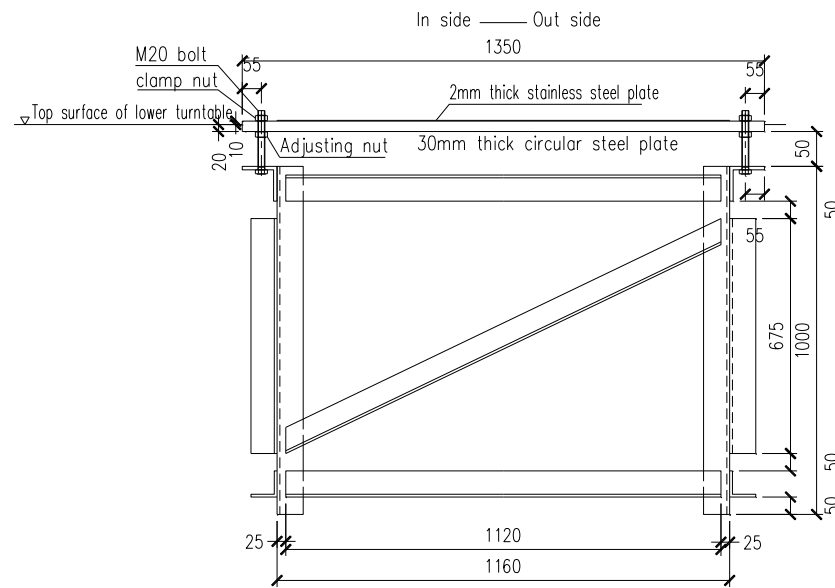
Turntable steel plate slideway and support frame elevation diagram (Unit: mm)
